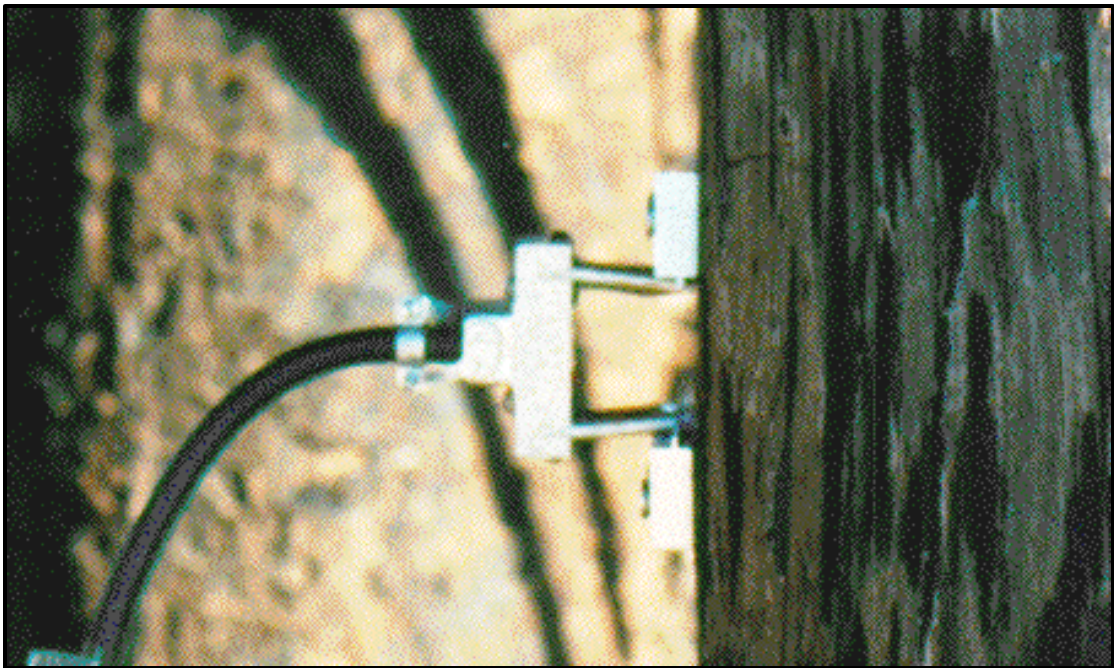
Photo of an extensometer installed on a pile on Bridge 101.
